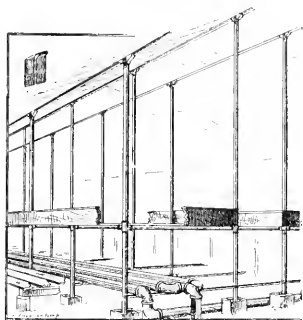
SHOWING GENERAL PLAN OF CONSTRUCTION
